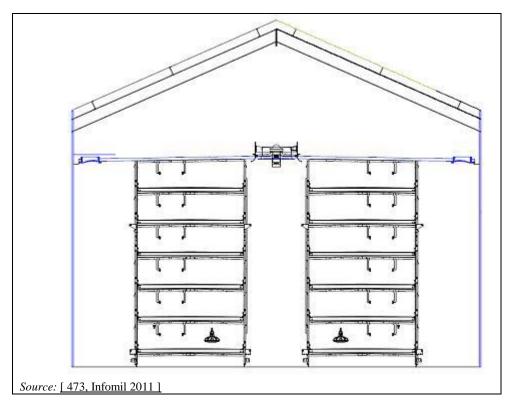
Schematic overview of the tiered floor system with two rows and six floors
